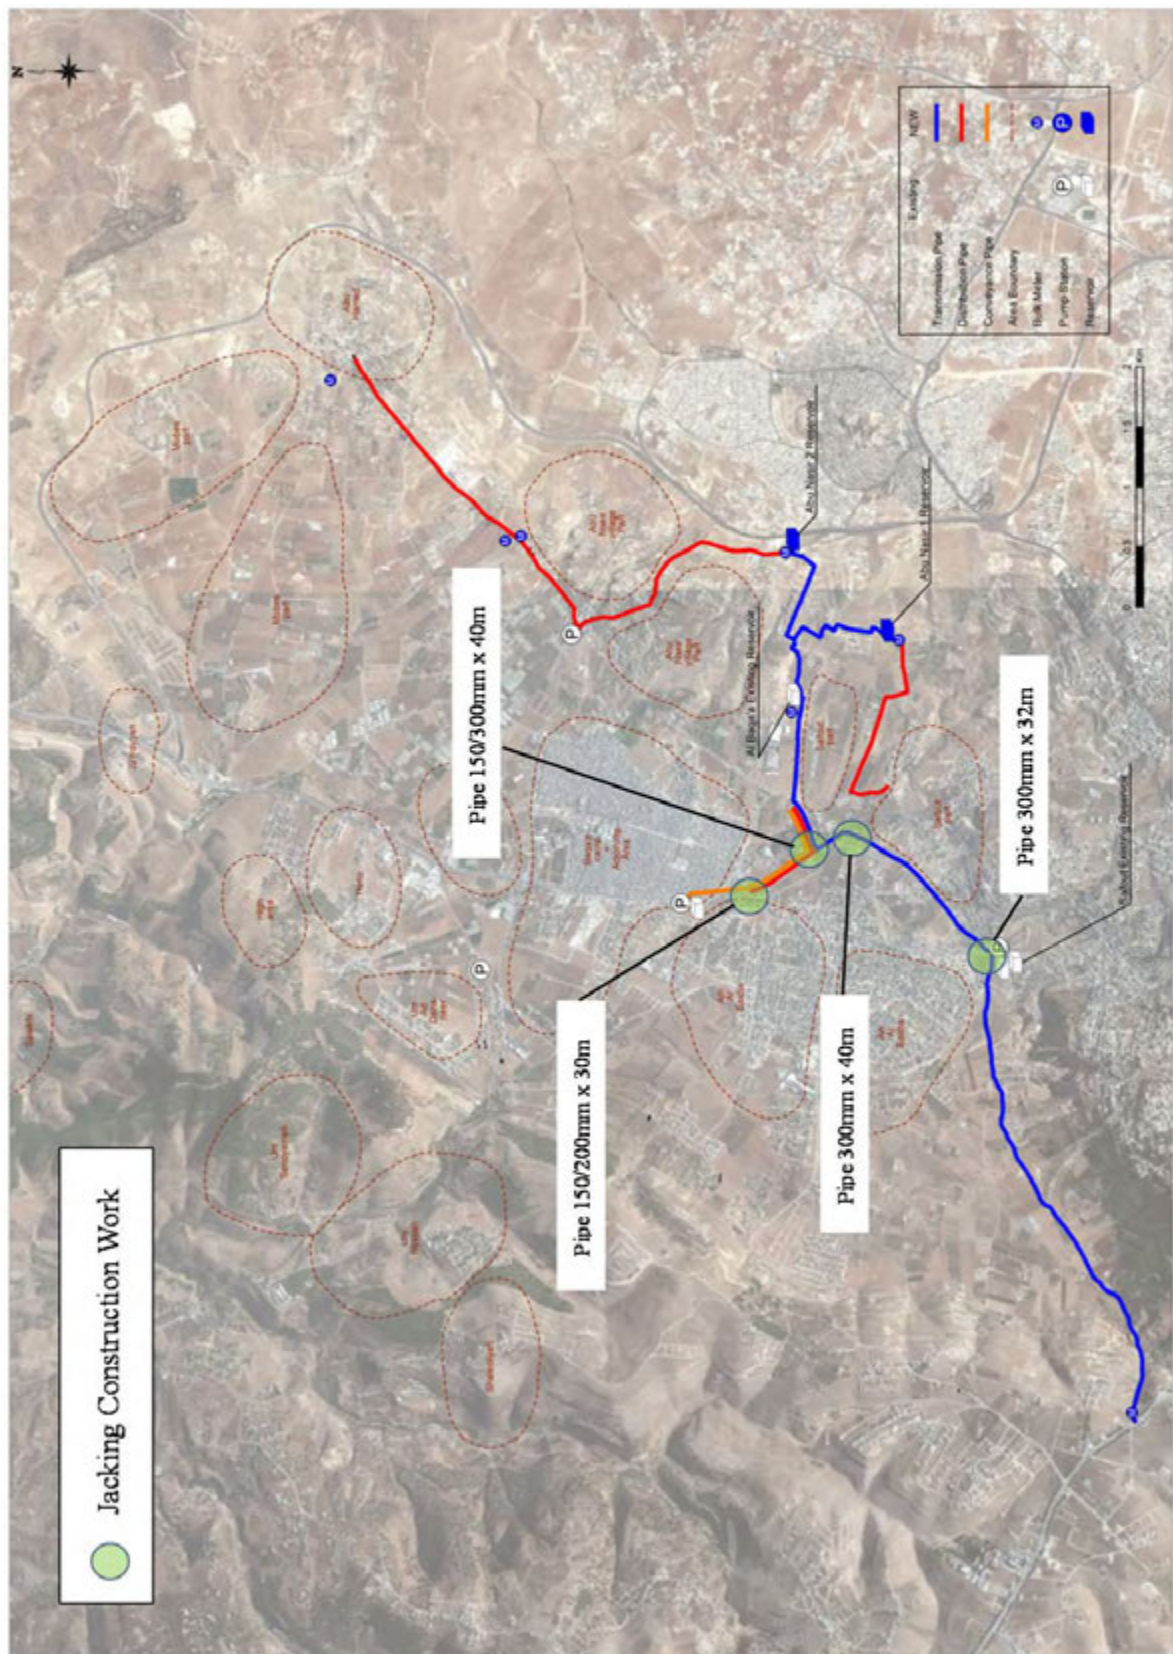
Construction locations of distribution pipeline work by trenchless construction method (Ain Al Basha)
